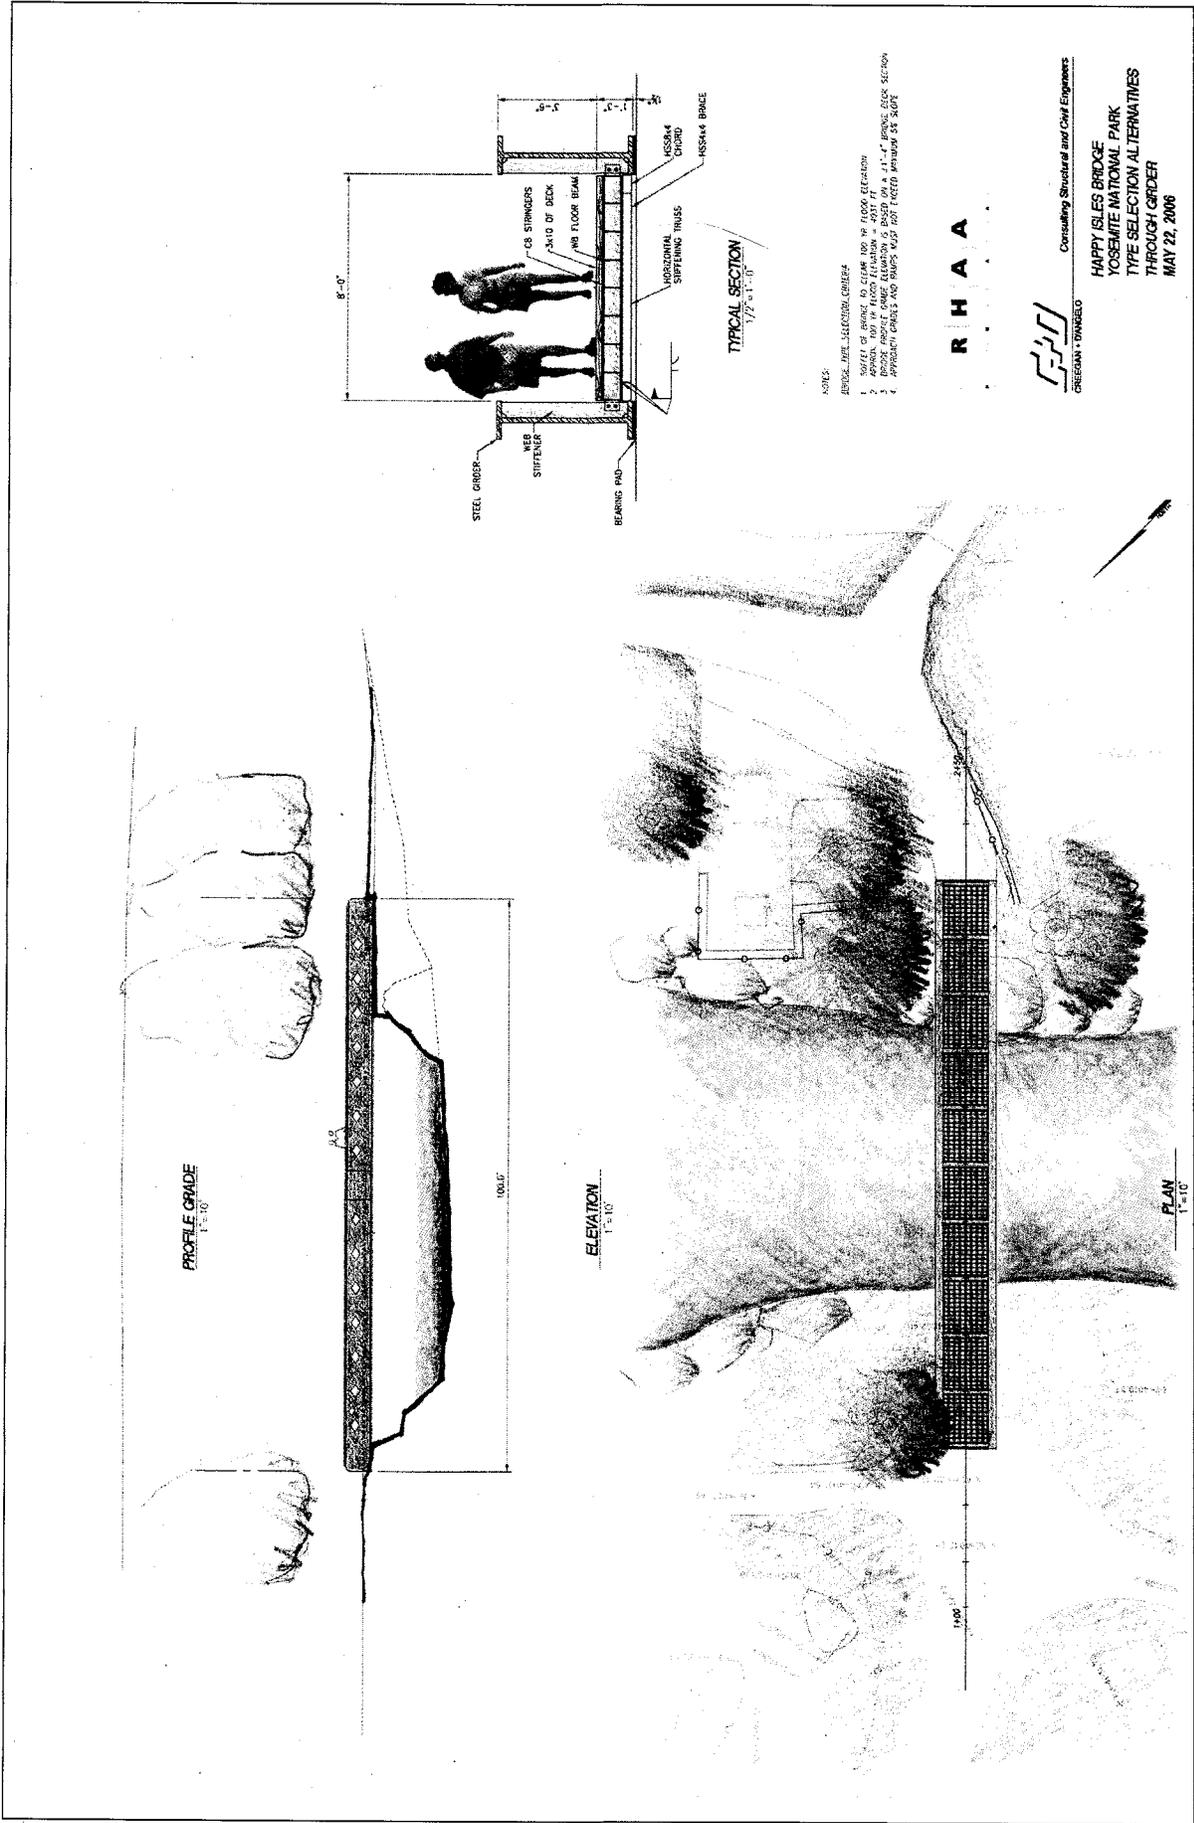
Steel Girder Bridge with Mid-level Deck: profile grade, elevation, plan, and typical section drawings
